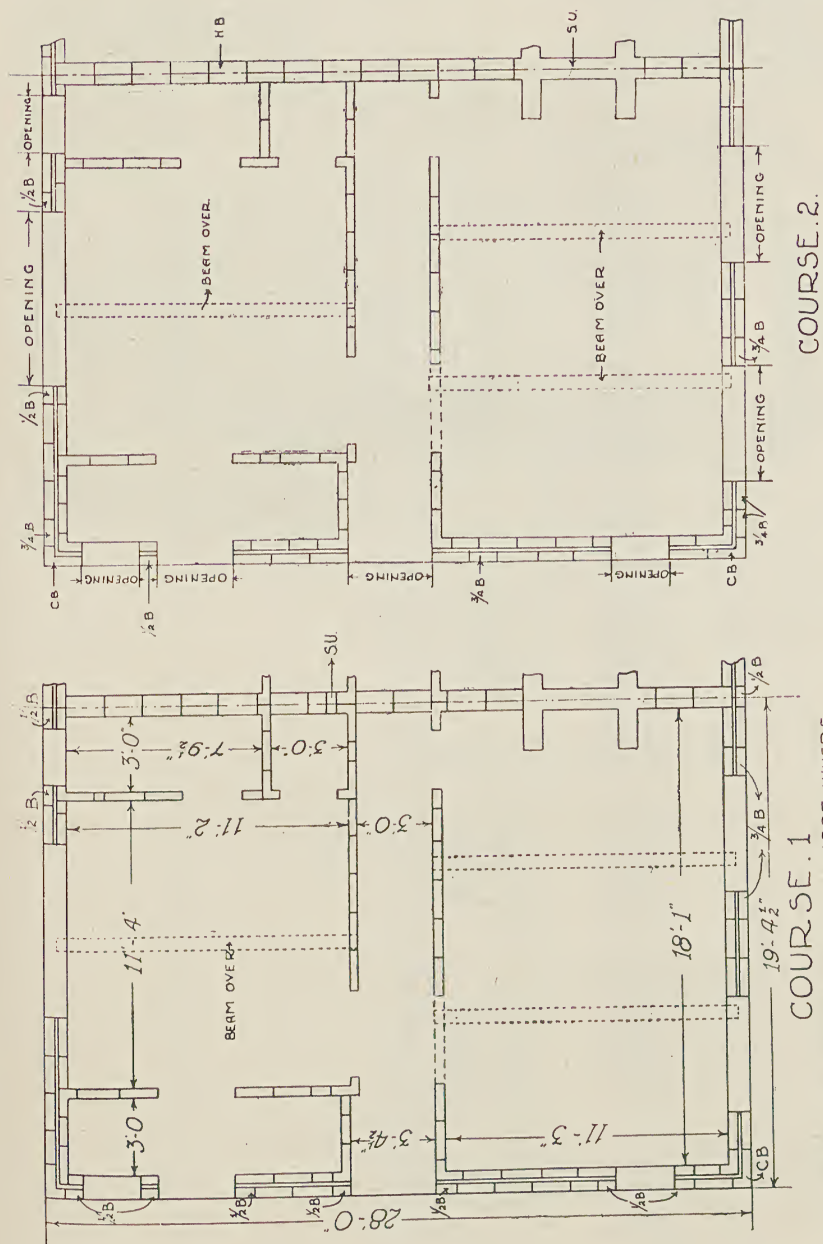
Type No. 2: PLANS SHOWING BONDING OF BLOCKS.
